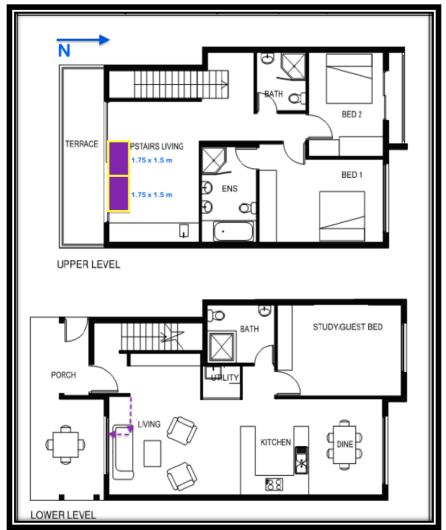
, Upper and lower level Plan view demonstrating location and dimension of the towers, Basic plan source NCCARF 2013.
